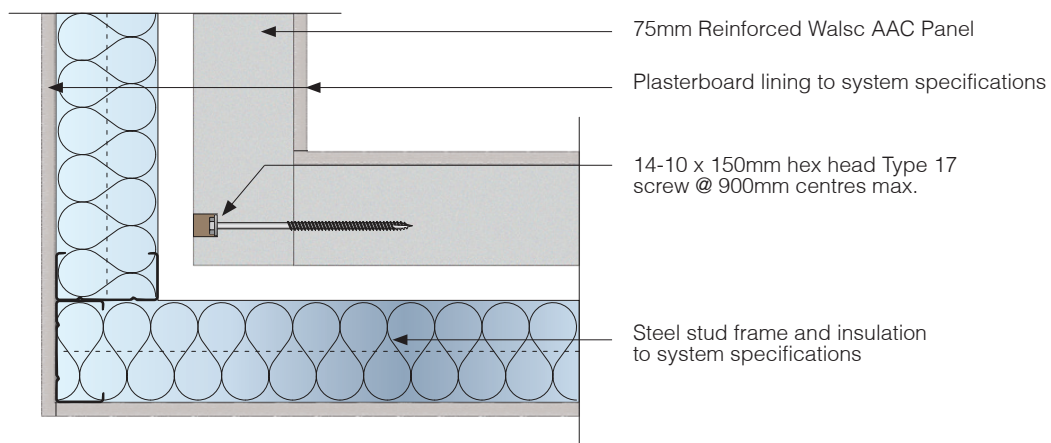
Internal Cavity Wall System Corner Fixed Joint Detail
